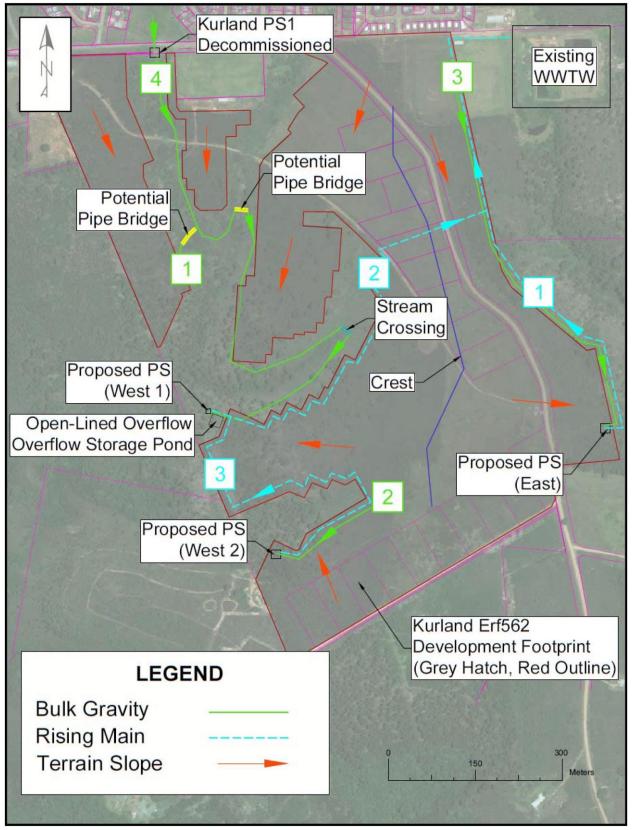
Alternative Sewer Outfall Concept (Appendix F3).
